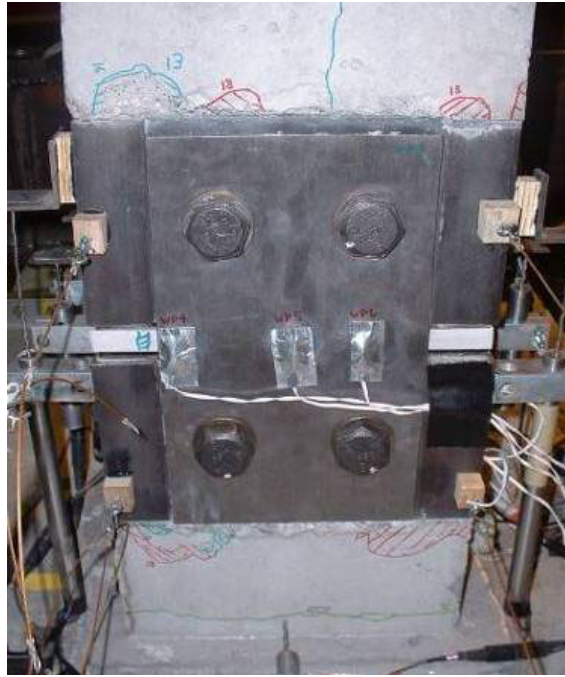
Photograph of Column 3 – Cycle 18b west face damage.
